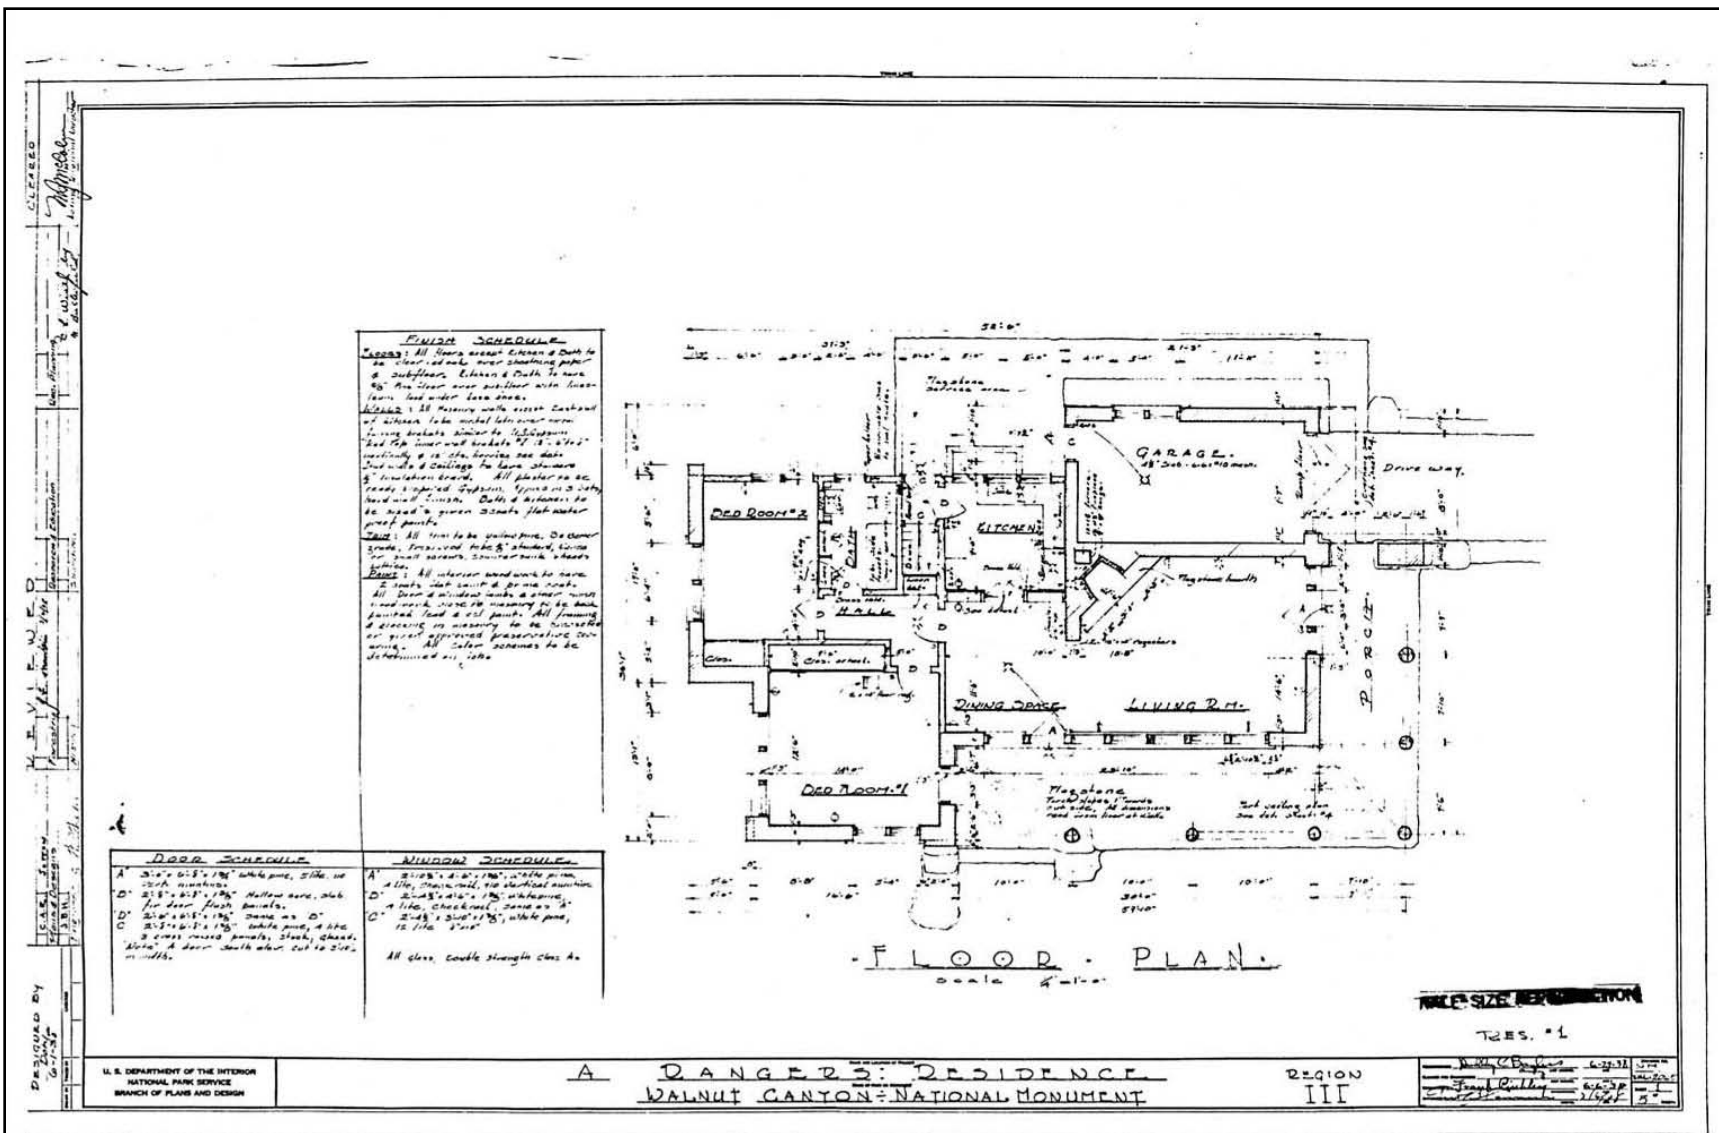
Building plan for Residence No. 1, floor plan, (NPS Dwg No. NM-WAL 2025, sheet 1), 1938, drawn by Cecil Doty.
